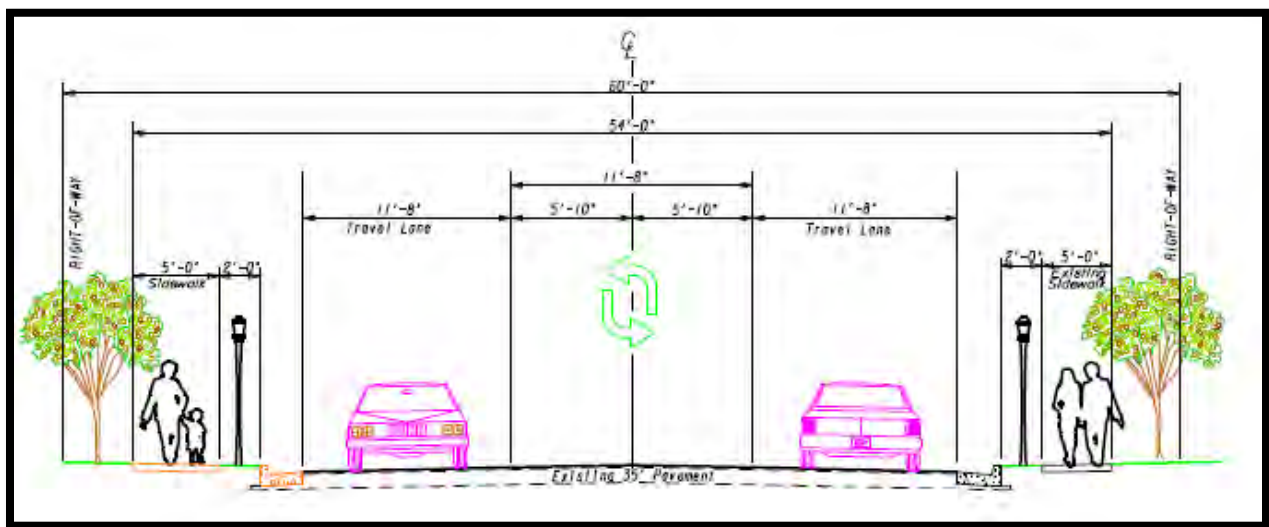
Proposed Typical Section – Alternative 2 – West First St. from Montgomery Ave. to Austin Ave.
